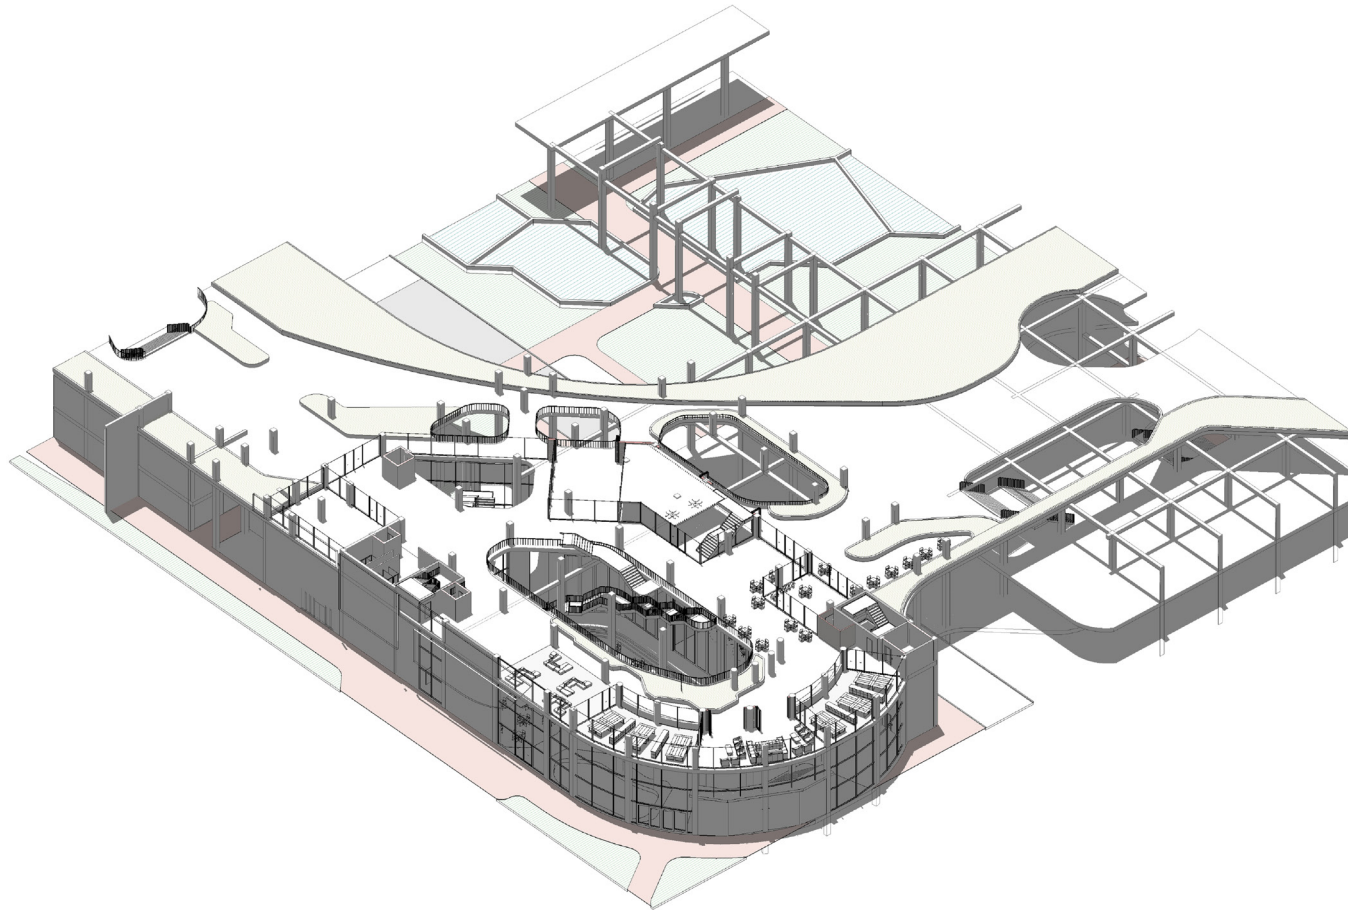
FIRST FLOOR AXONOMETRIC (AUTHOR 2021)
